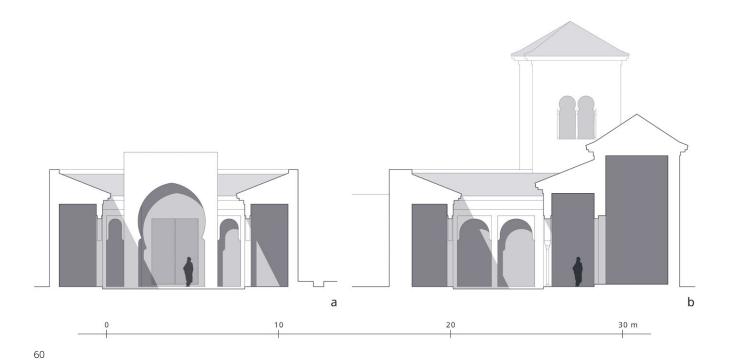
Monteagudo, entrance courtyard. Hypothetical restitution: a. east-west section with entrance gate, looking south. – b. southnorth section, looking west.
